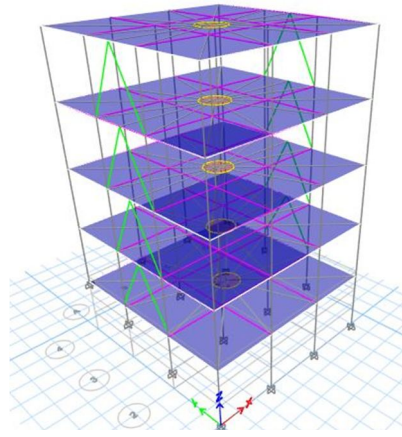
Model 4: G+4 Building With Inverted V- Bracings at 20⁰ Slope
